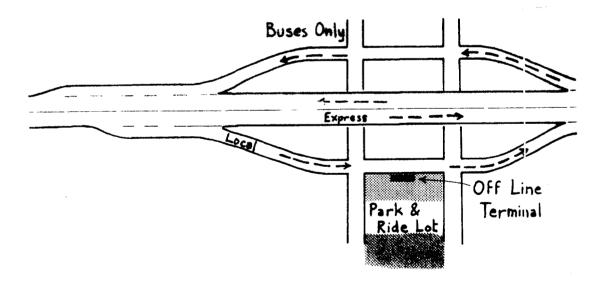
Operational Plan, Narrow Guideway for Buses Only, Elevated Portion
